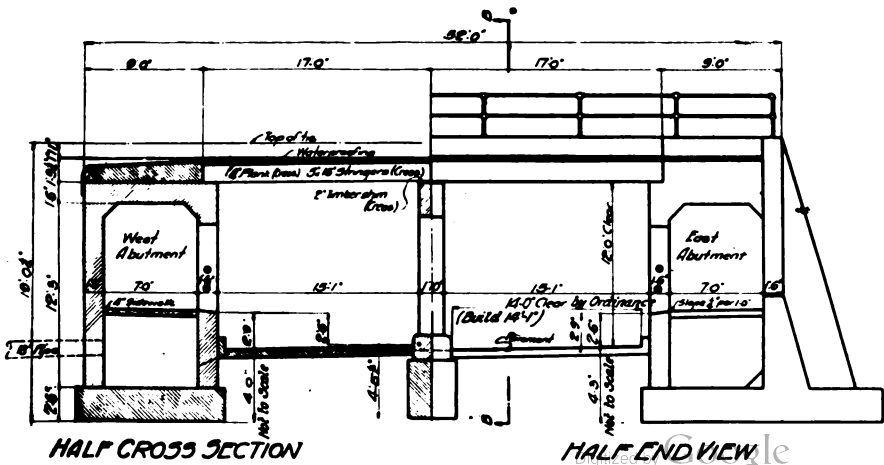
BALLASTED TIMBER DECK SUBWAY WITH CONCRETE FILLER OVER SIDE-WALK SLAB.
